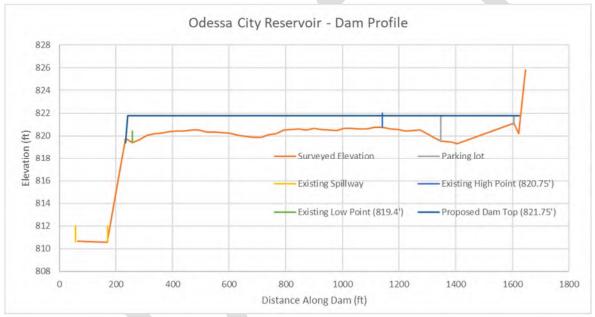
Dam Profile with Existing and Proposed Profiles
